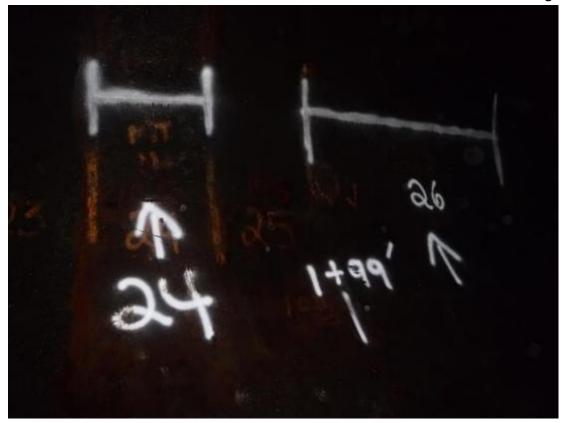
Typical markings for numbering cans, welds, and stationing 2020
